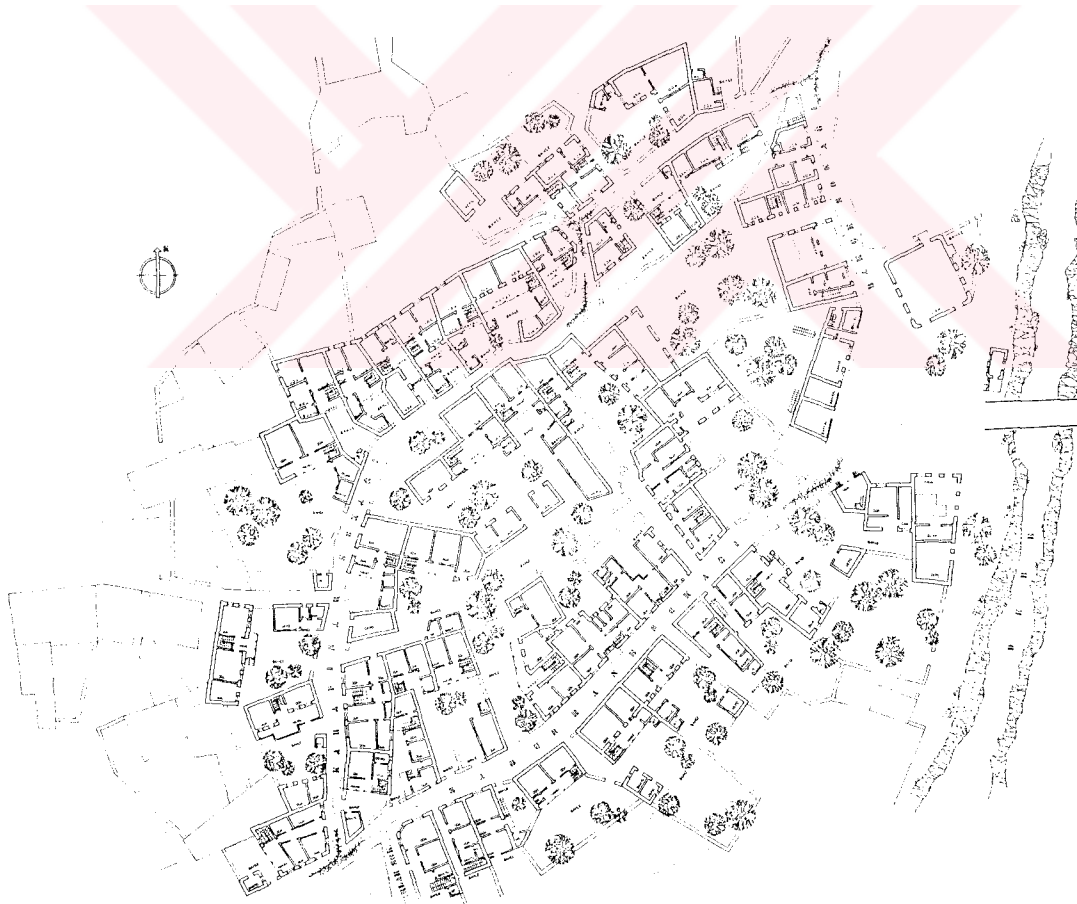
Ground Floor Plan of Muğla Houses, 19 th. Century Drawn by Tosun.
